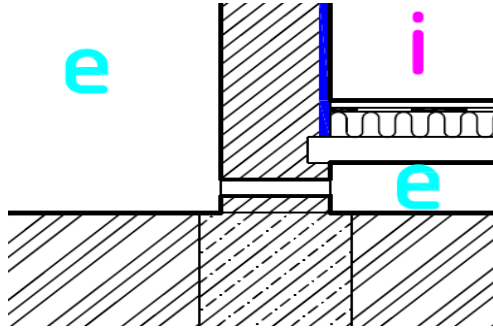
Scheme of ventilated air floor after placing the thermal plaster
